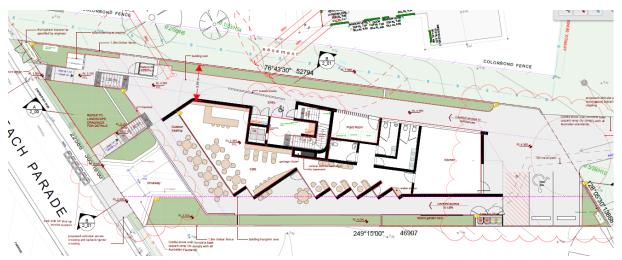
Amended architectural plan showing ground floor and reduced landscape areas.
